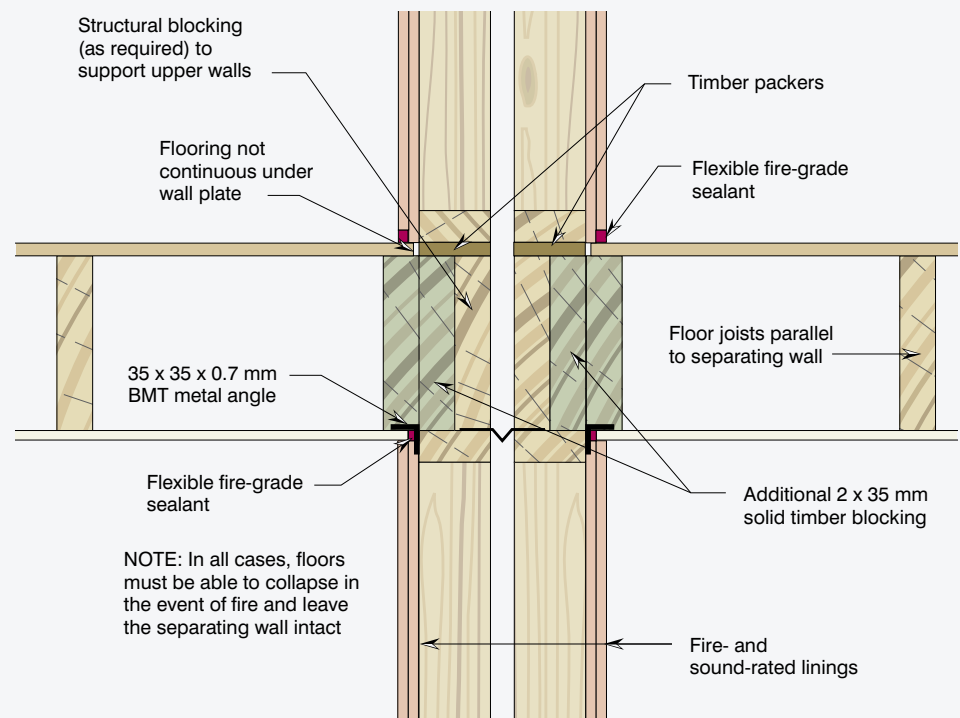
Joist parallel to the wall, wall stud not continuous through junction – FRL 90 minutes – elevation view.
